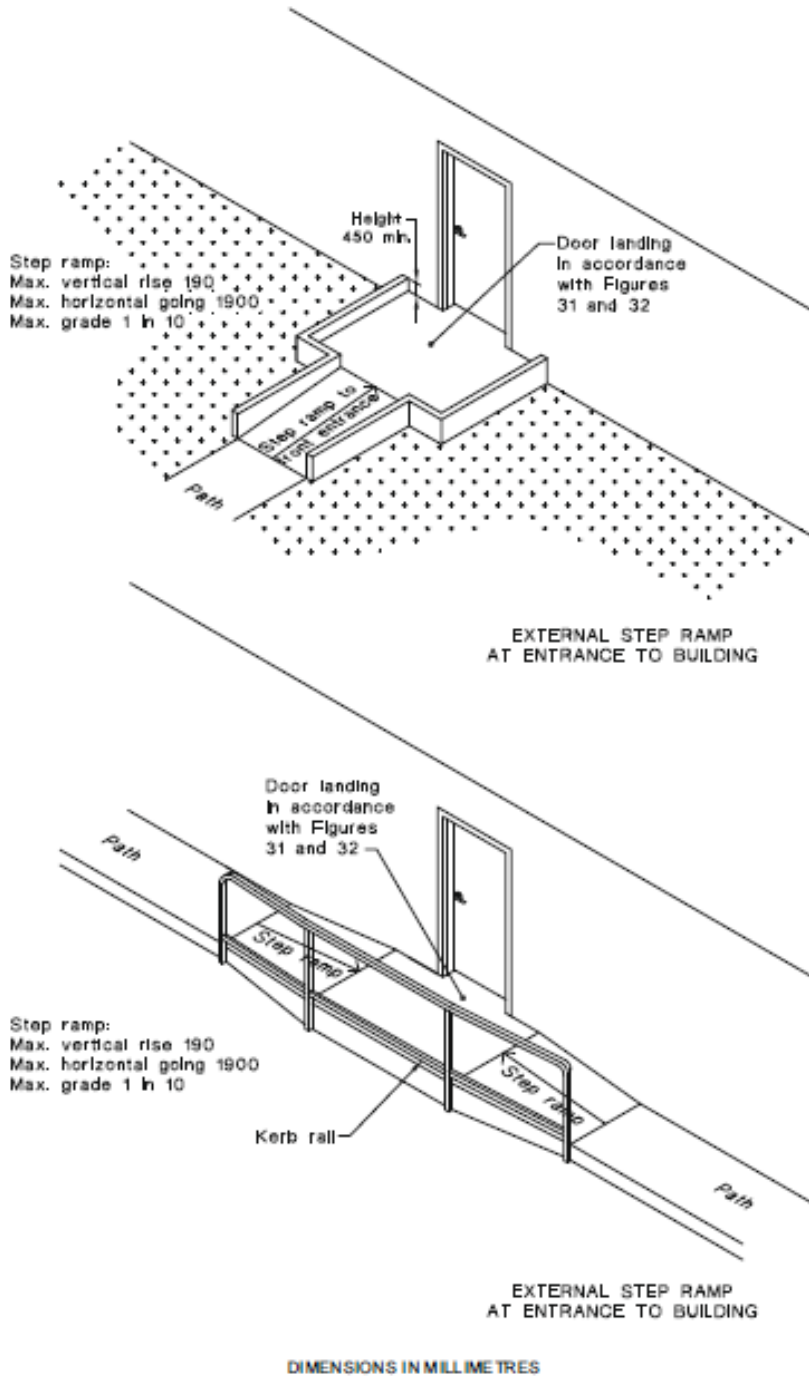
(B) EXTERNAL STEP RAMPS AT ENTRANCE TO BUILDING
